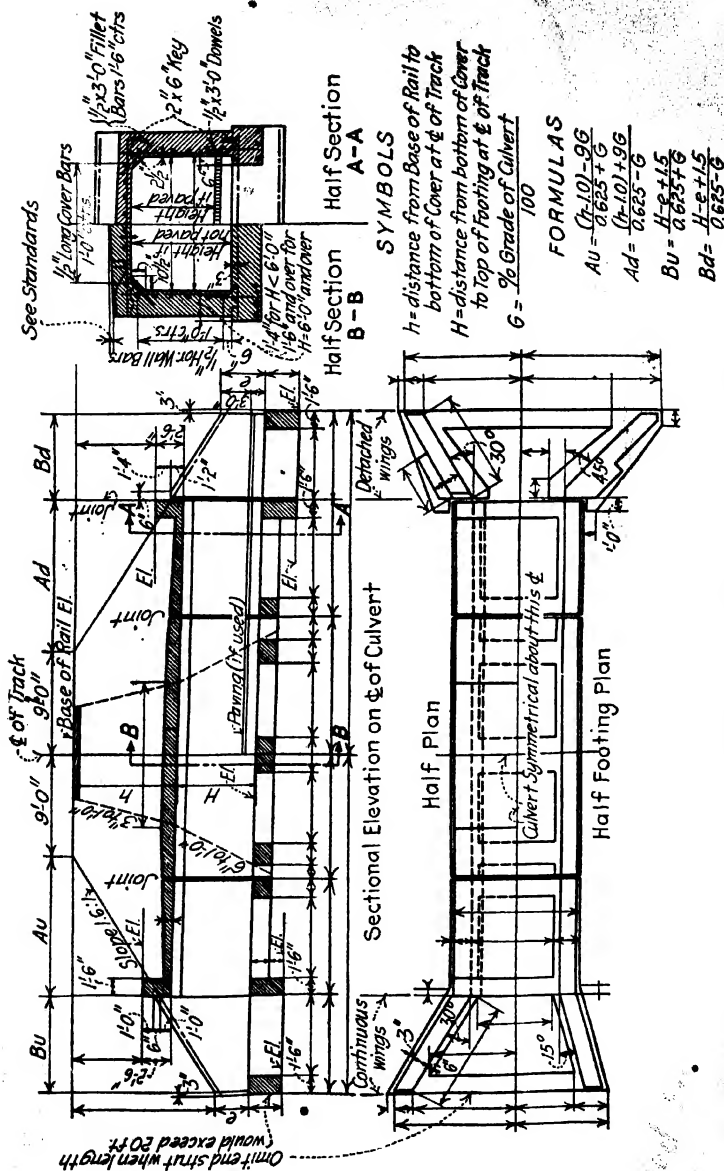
Layout of rectangular culvert, C. M. & St. P. Ry.
